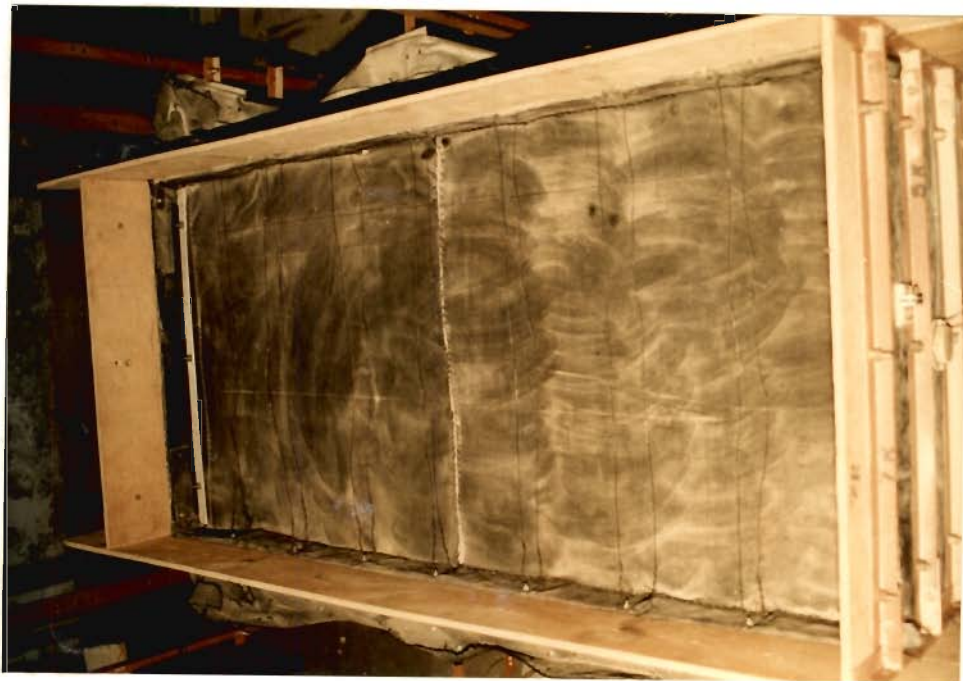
VIEW OF THE TEST SETUP AFTER PLACING AND CONNECTING THE GEOTEXTILE REINFORCEMENT.
